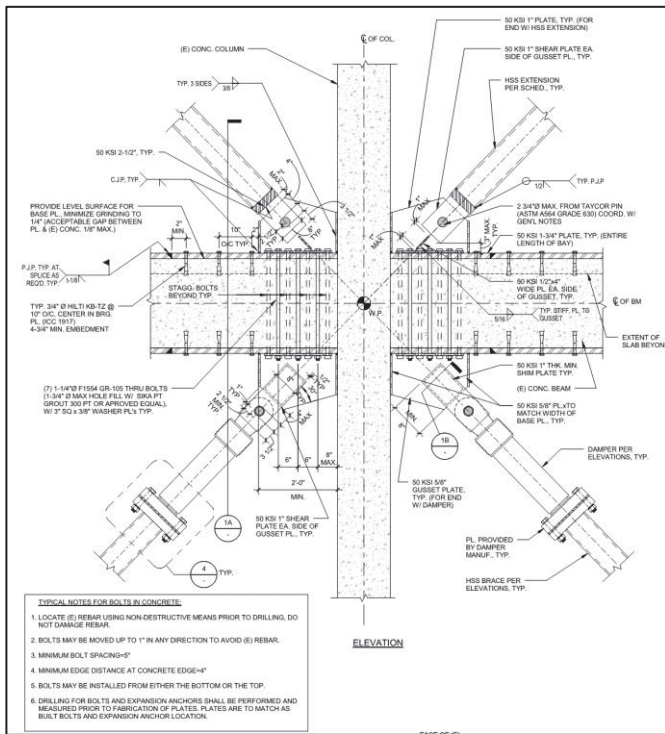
Damper connection to existing concrete beam-column joint detail.
